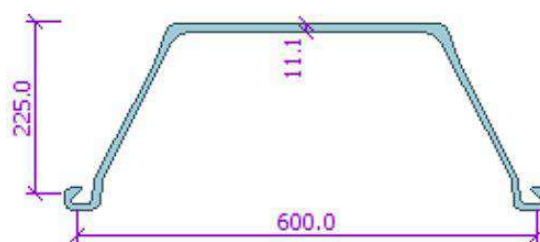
retaining structure of the pit wall and a diagram of the grooves
